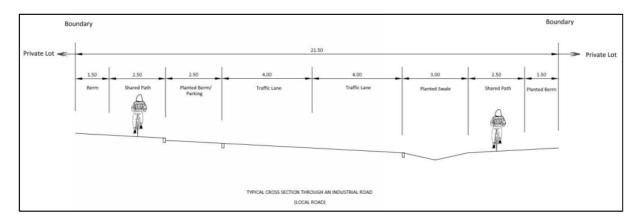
Proposed Industrial Road Cross-Section (both primary and secondary roads)
